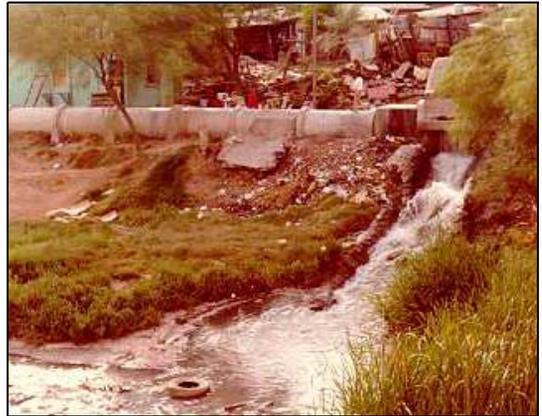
Raw sewage bypass from North Collector to Drain 134 (May 1978)
